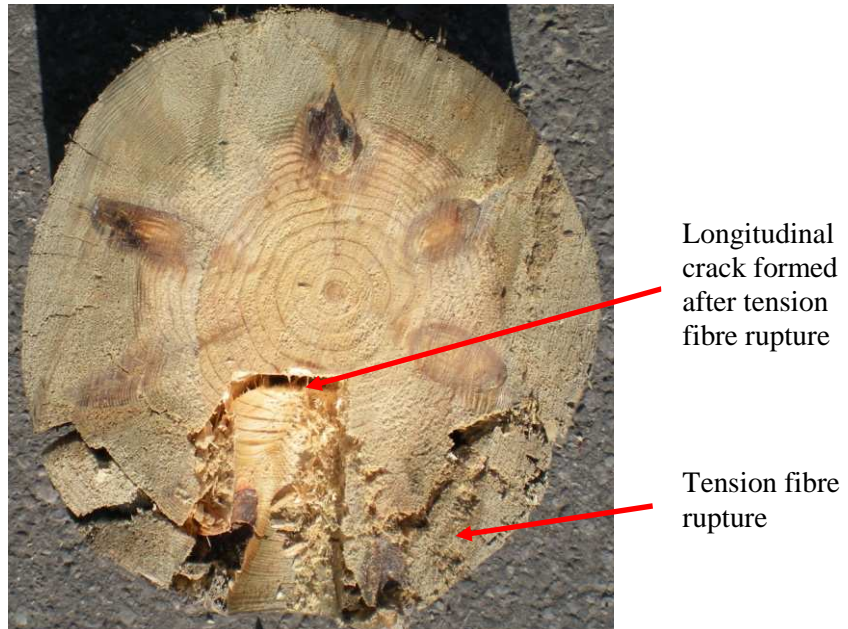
Cross-section of new pole specimen with tension exploratory damage (45-2-3).
